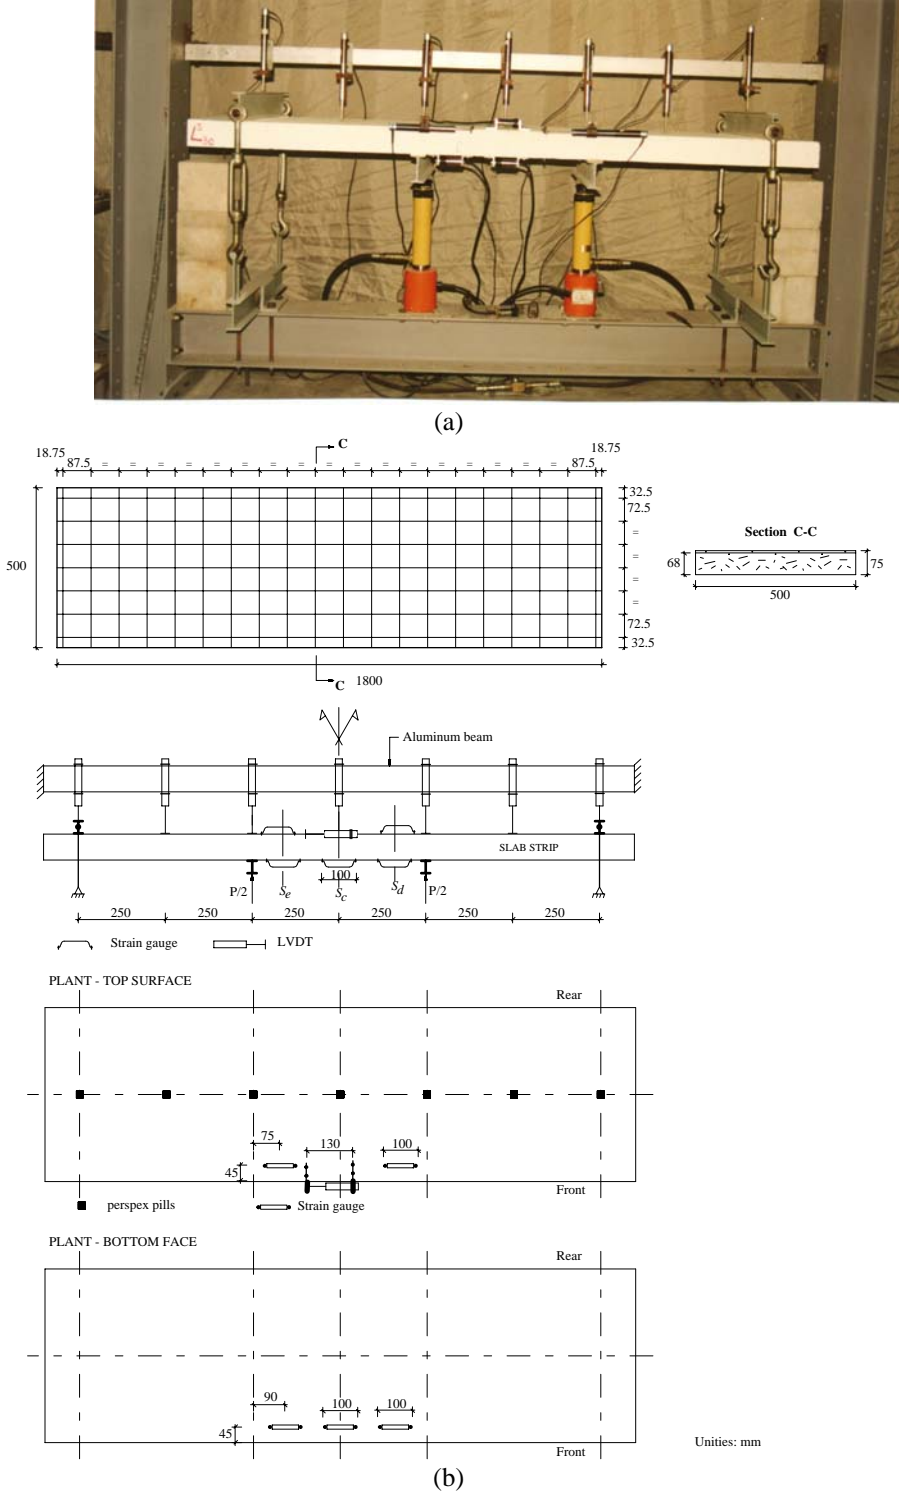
Setup of a slab strip test (a), slab strip geometry, support and load arrangement and details of instrumentation (b).
